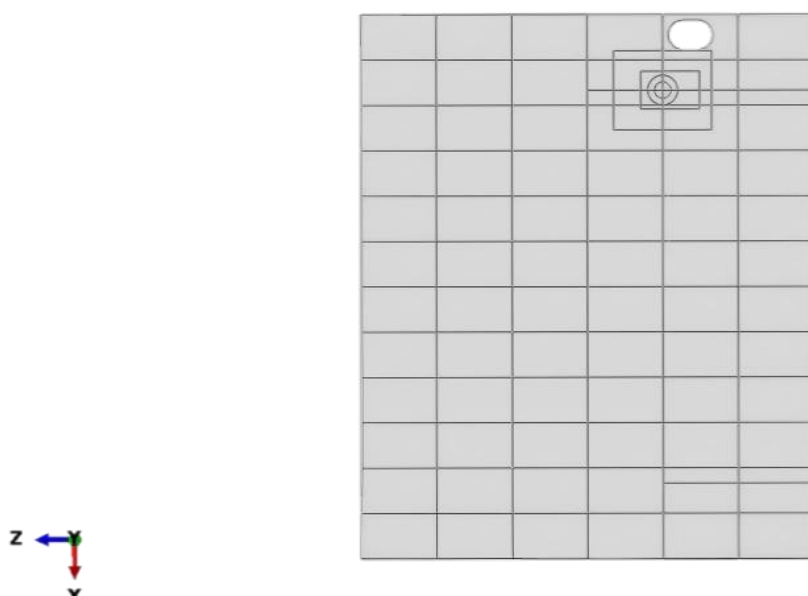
Deck plan showing the layout of longitudinal and transverse reinforcements and columns in Abaqus
